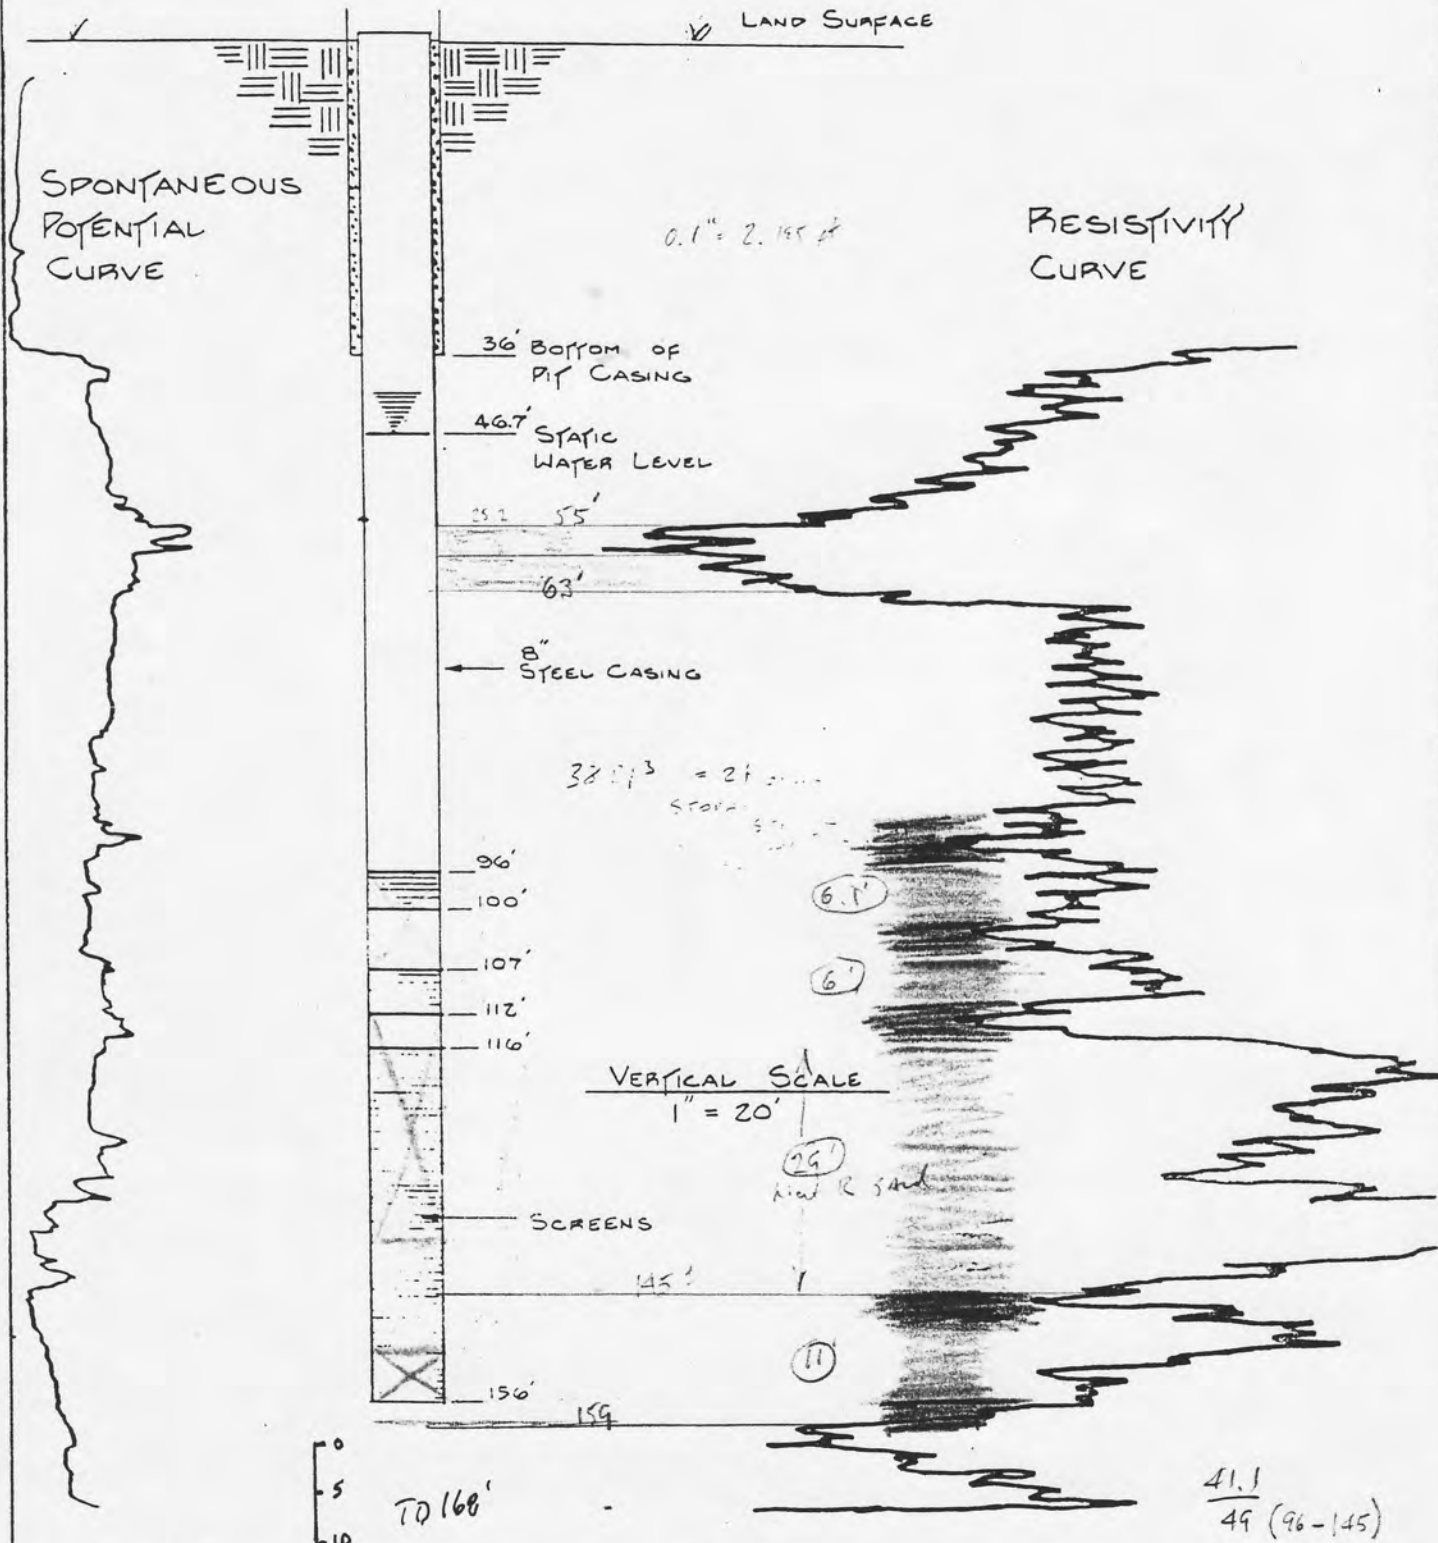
Well Construction Details and Electric Log of Well No. 10
